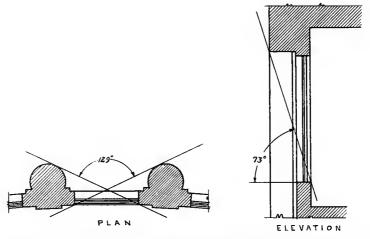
Plan and elevation of a window showing obstructious to admission of daylight and limiting horizontal and vertical visual angles.
